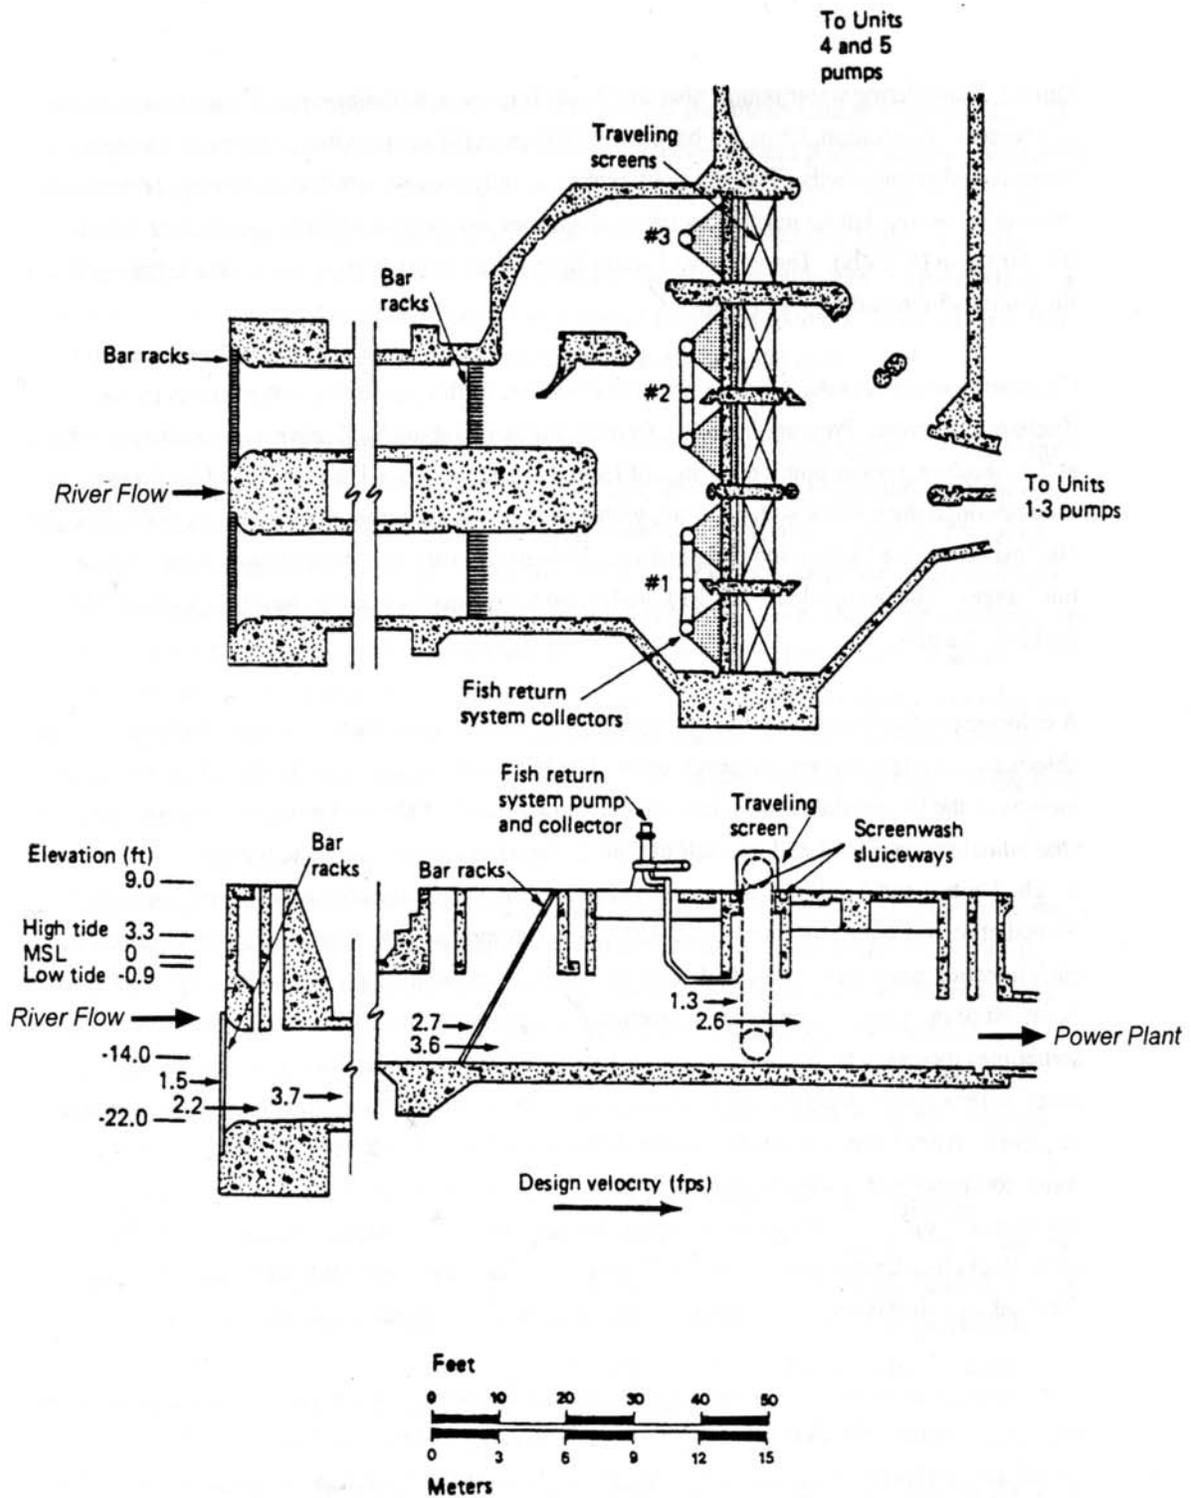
Plan and section schematic diagrams of Contra Costa Power Plant Units 1-5 intake structure. (PG&E)
